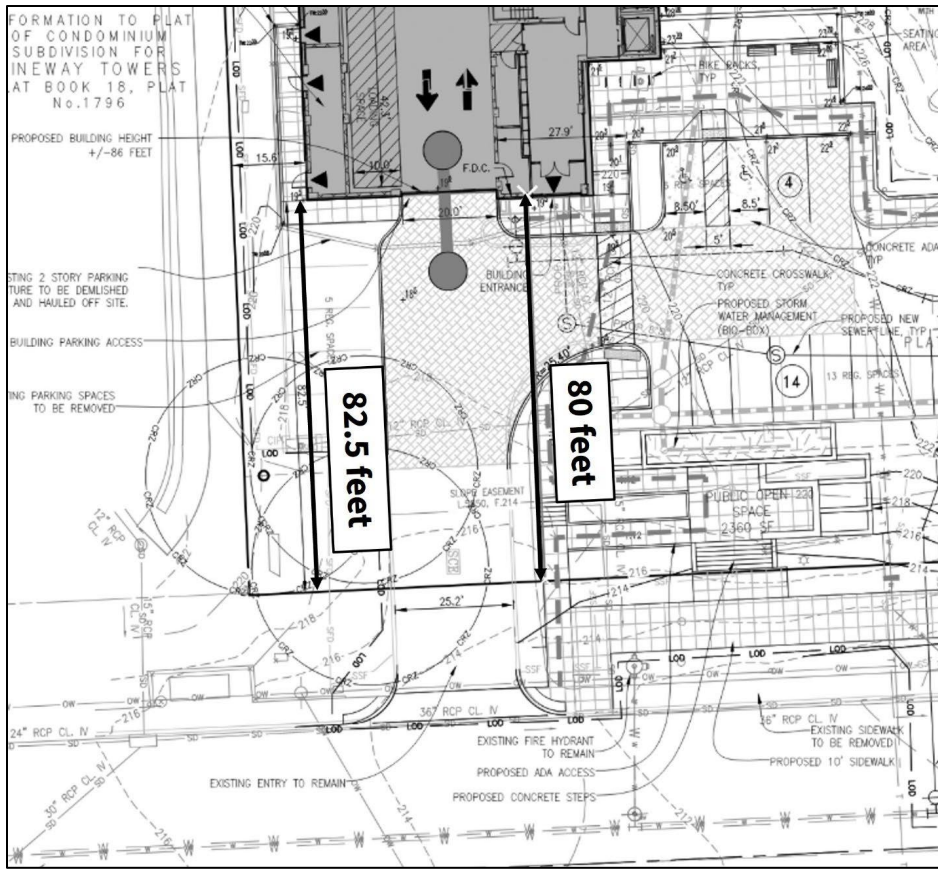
Portion of Applicant's Site Plan drawing submitted on December 8, 2021, ahead of the March 17, 2022 Planning Board Hearing, showing front setback dimension line drawn from the front Property Line to a portion of the front façade with a setback of 82.5 feet, however a portion of the front façade bumps out to a dimension of 80 feet from the front Property Line.
